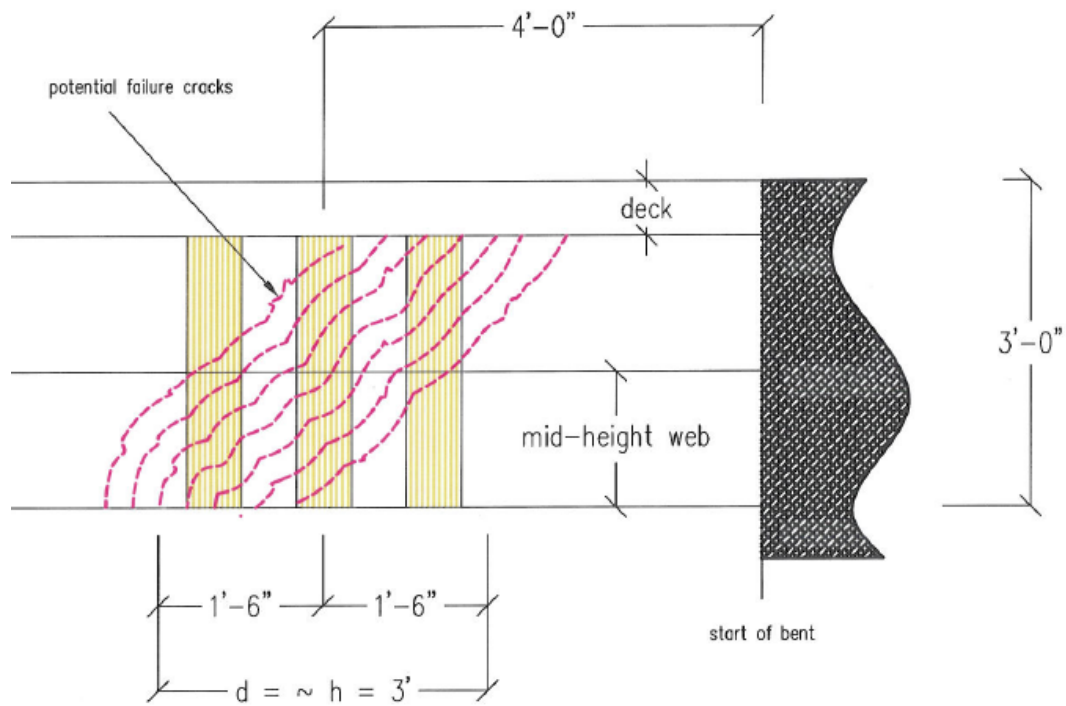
Illustration of CFRP design providing at least 1 strip crossing potential diagonal cracks at midheight of the stem near section 4 ft from bent.
